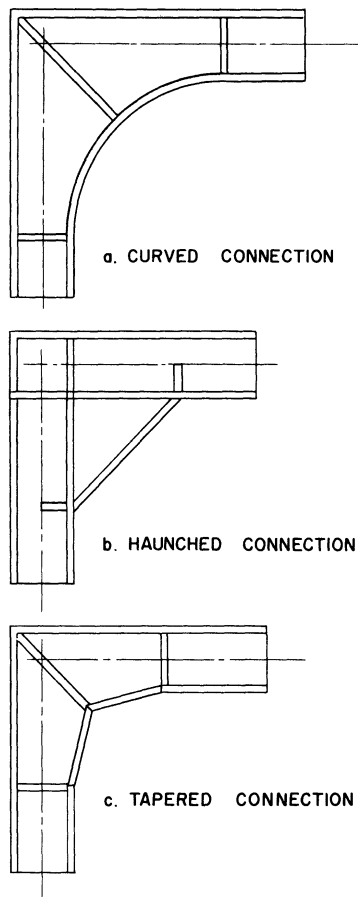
Types of Built-Up Connections Tested by Topractsoglou, Beedle, and Johnston.
